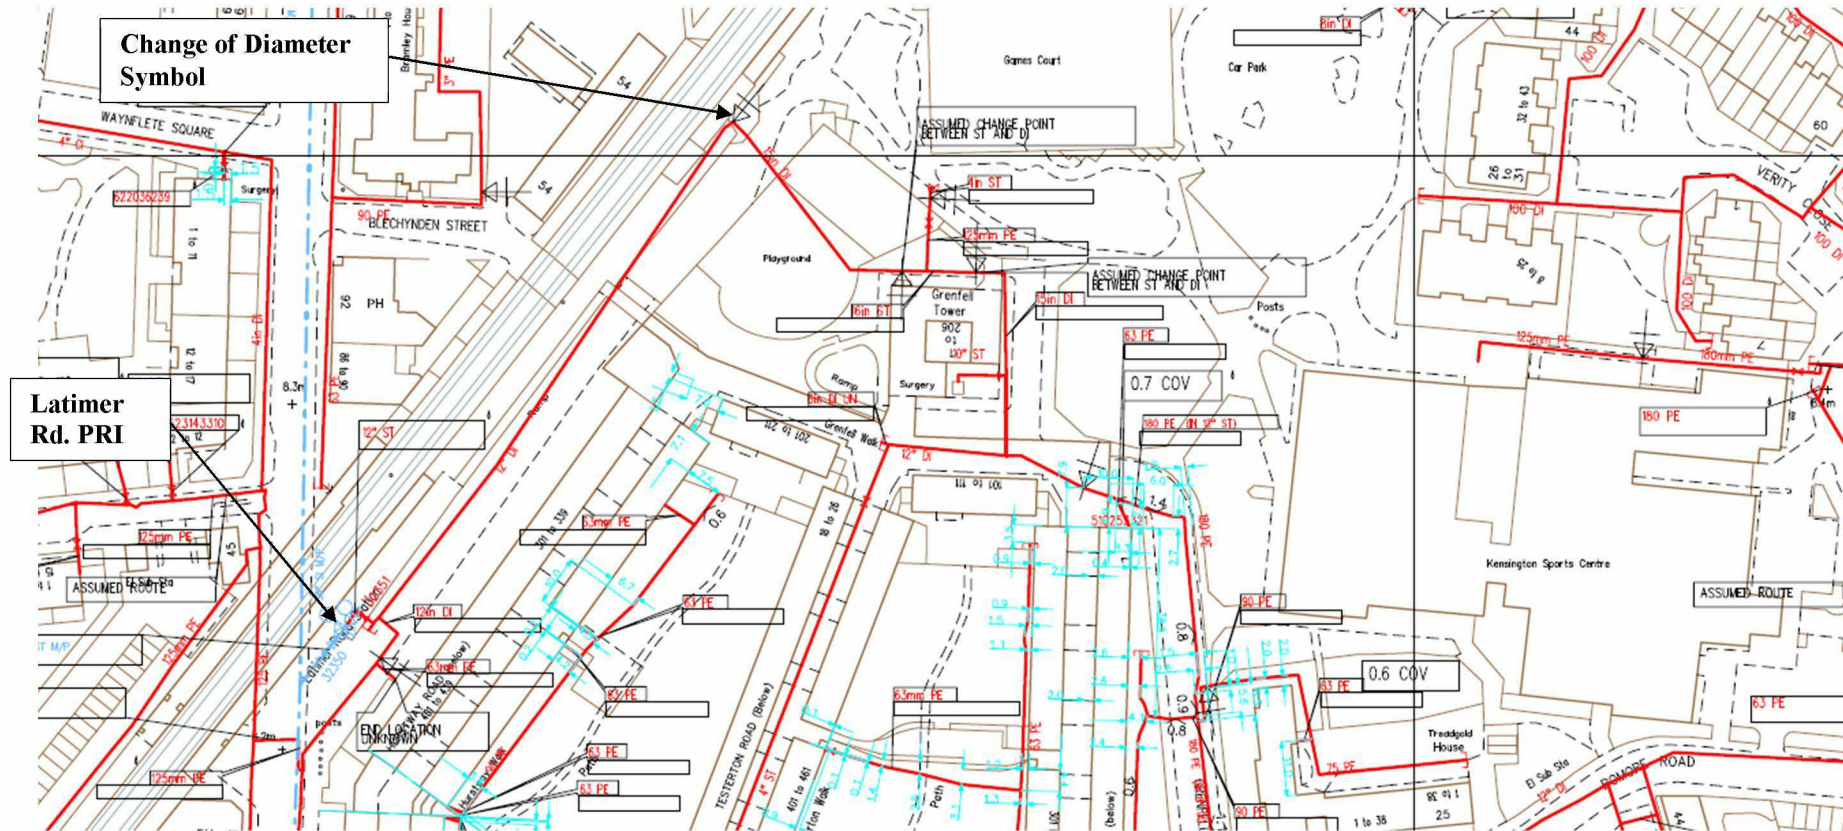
Extract from Cadent Gas Ltd's Network Plan of the Area Surrounding Grenfell Tower as at 14<sup>th</sup> June 2017
